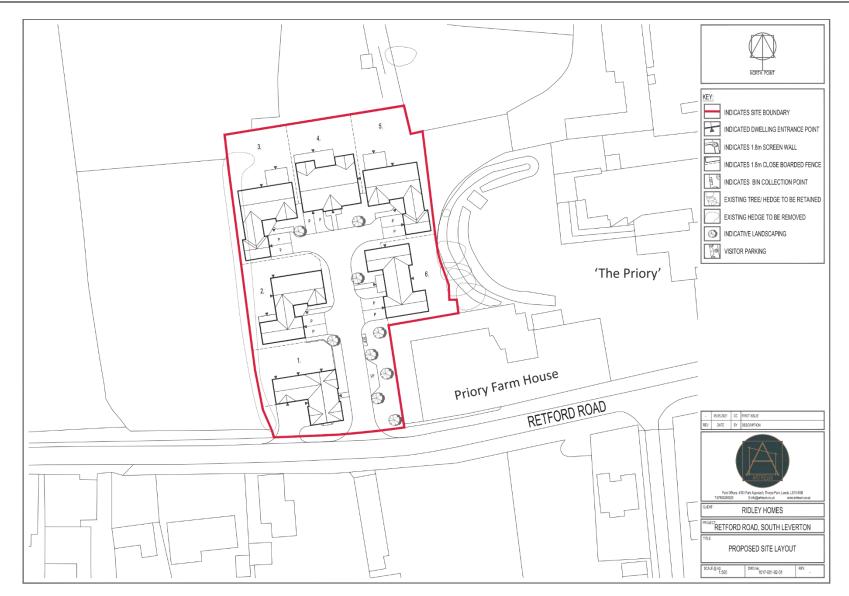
Land at Priory Farm, Retford Road, S. Leverton. Indicative site layout (Artreum May 2021).
